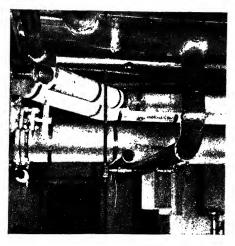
Typical installation of welded brass piping. Observe use of welding elbows.
